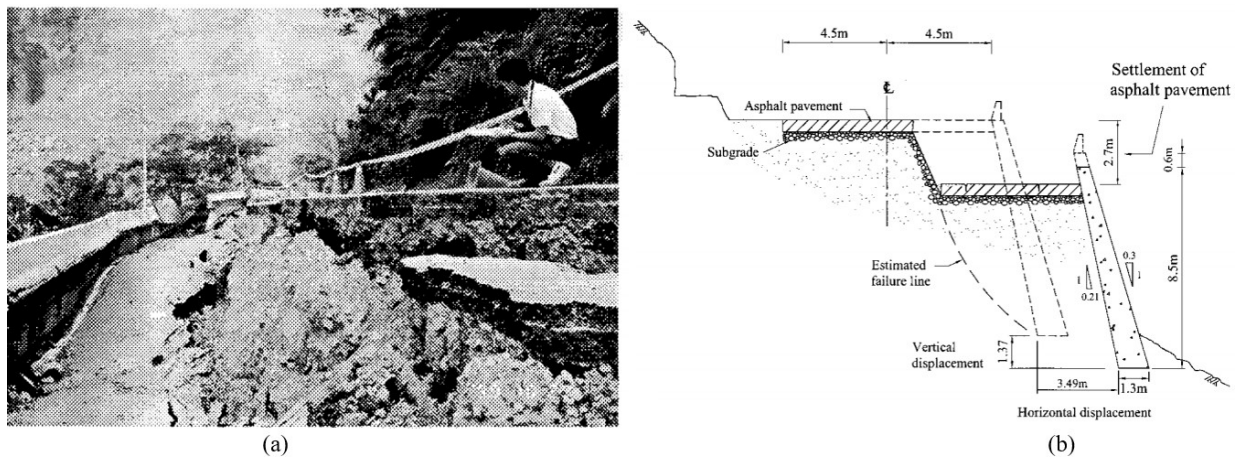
(a) The picture of the failed embankment and wall belonging to Case 2, (b) The cross-section of failed embankment and wall [12].
